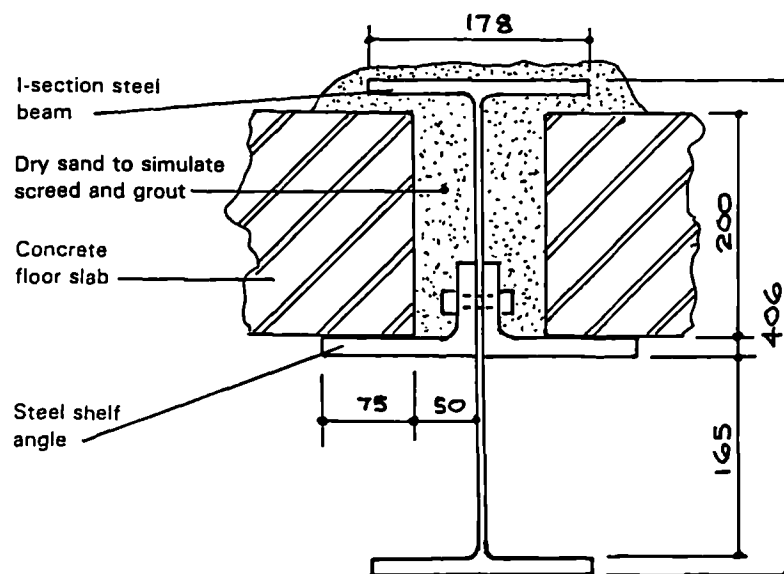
Section through 406 mm deep shelf angle floor beam
